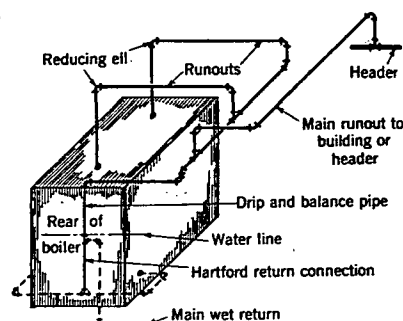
APPROVED METHOD OF BOILER CONNECTIONS
